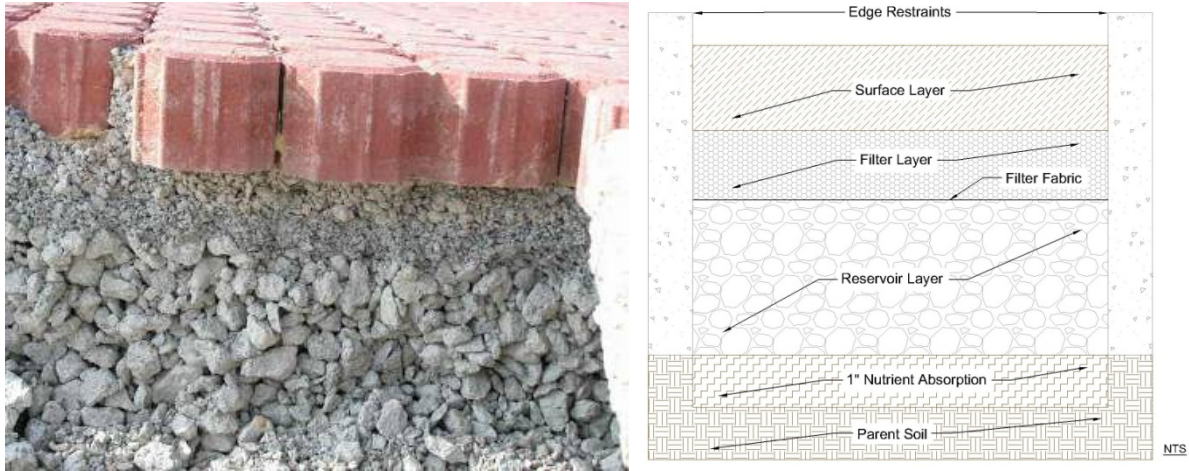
Typical Modular Paver Pervious Pavement System Cross Sections
